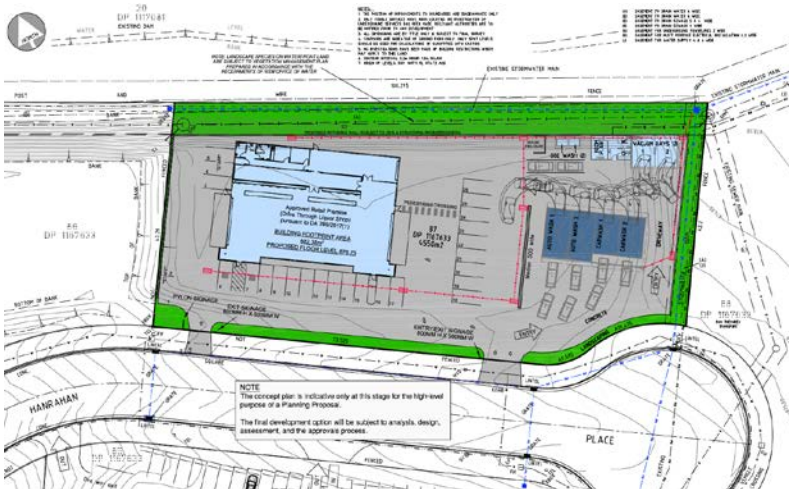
Proposed development layout – proposed carwash, eastern side and approved drive through bottle shop in the west (Planning Proposal)
